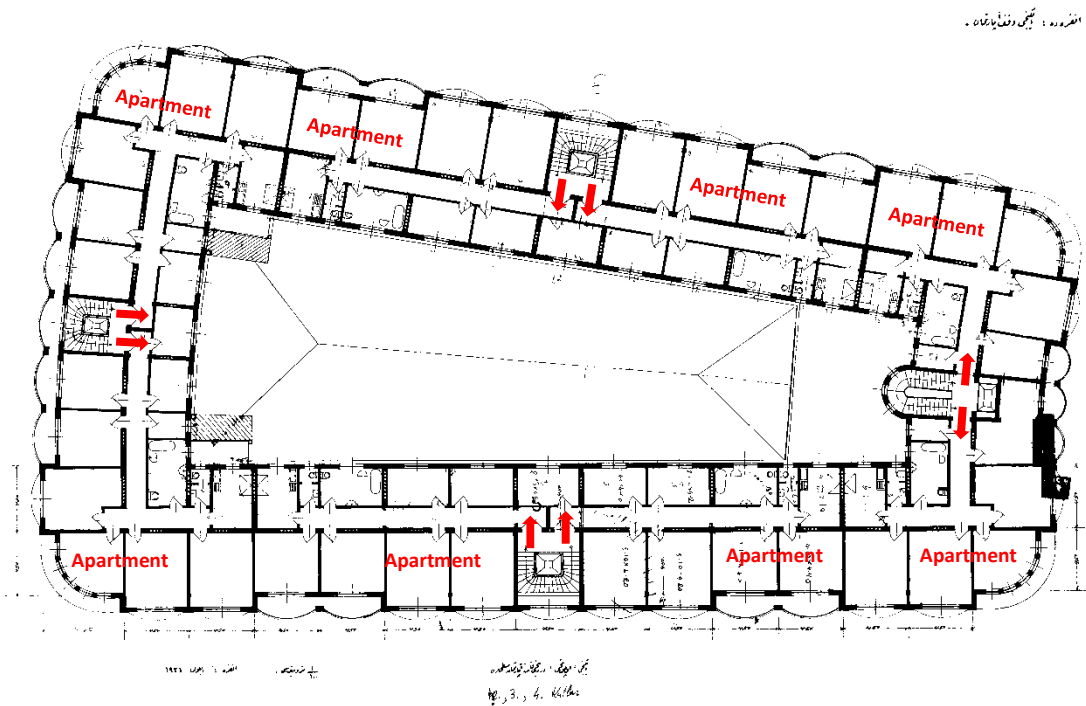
İkinci Evkaf Apartmanı Building Second, Third and Fourth Floor Plan [20].
